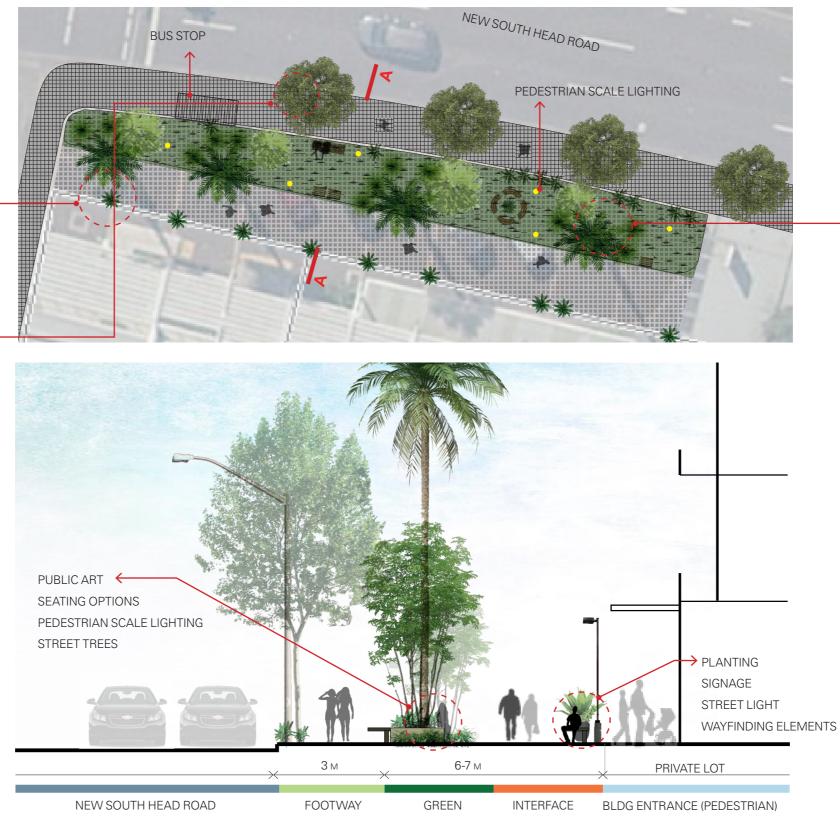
Indicative public domain plan and street section of linear park in front of 85-97 New South Head Road Edgecliff
